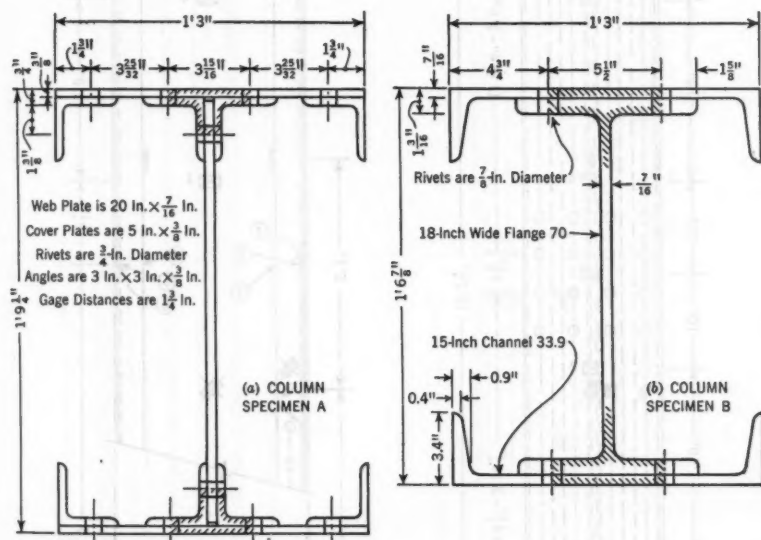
CROSS SECTIONS OF TEST SPECIMENS
